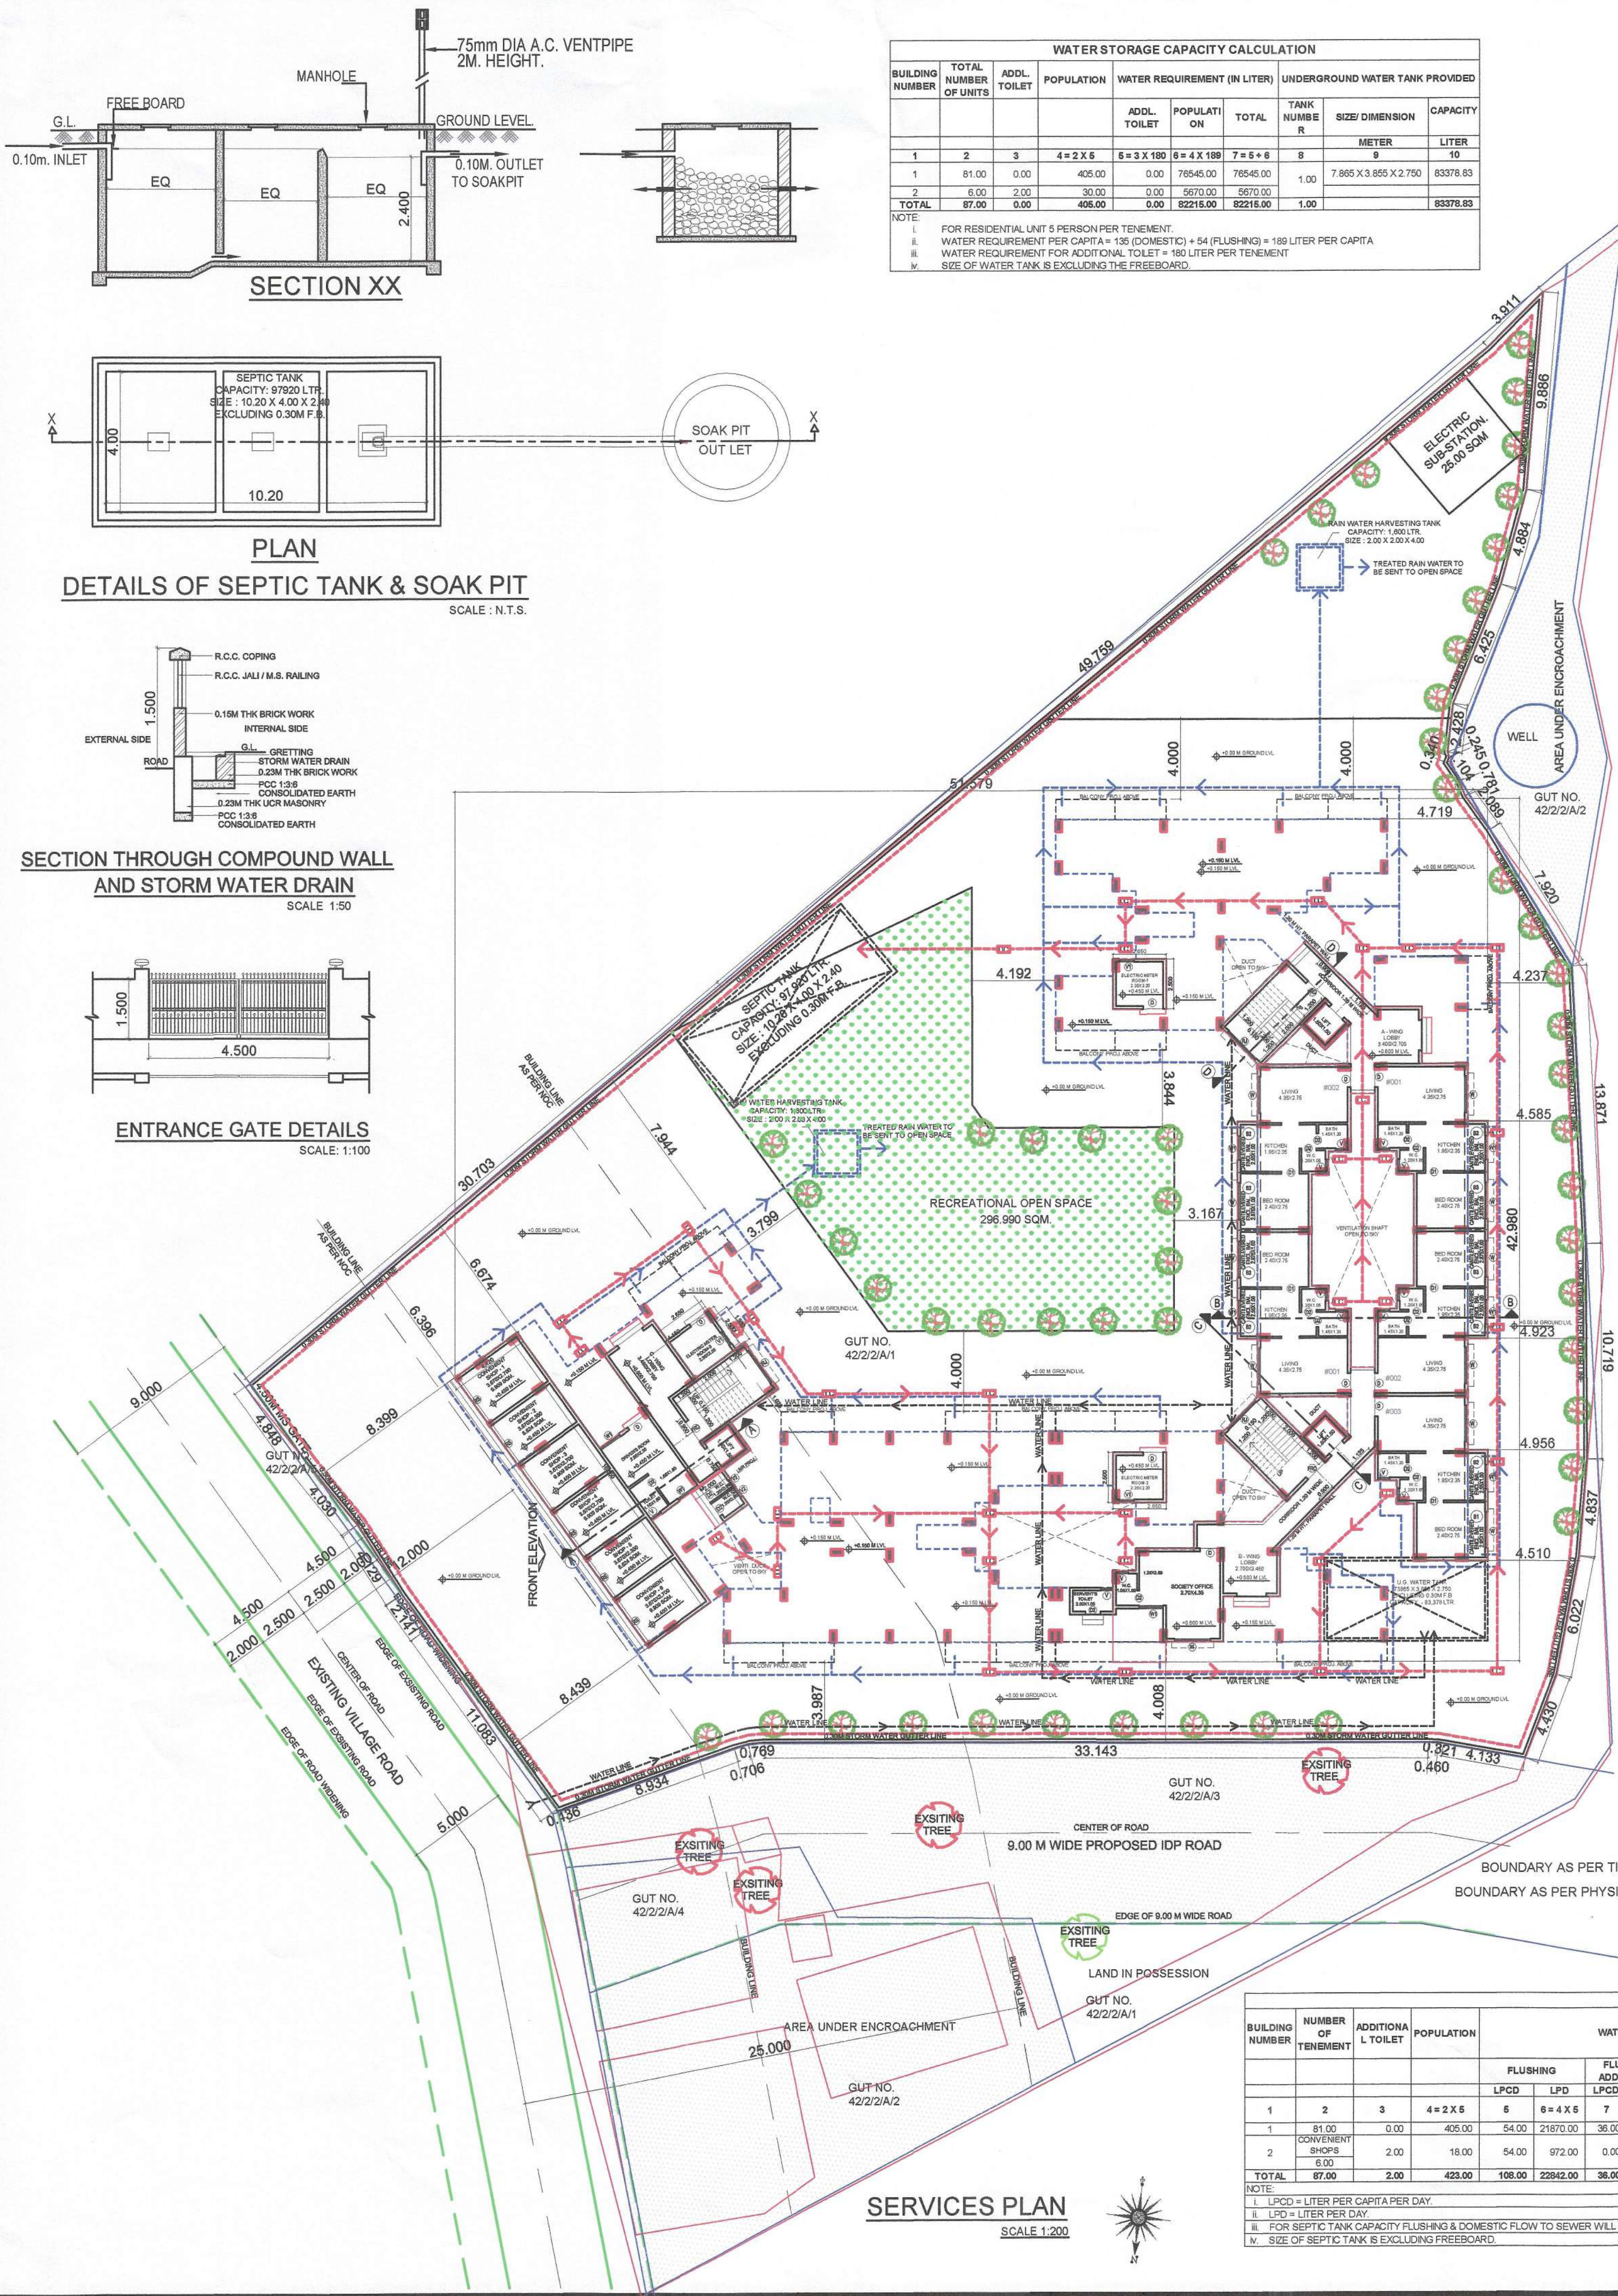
DETAILS OF SEPTIC TANK & SOAK PIT SCALE : N.T.S.
